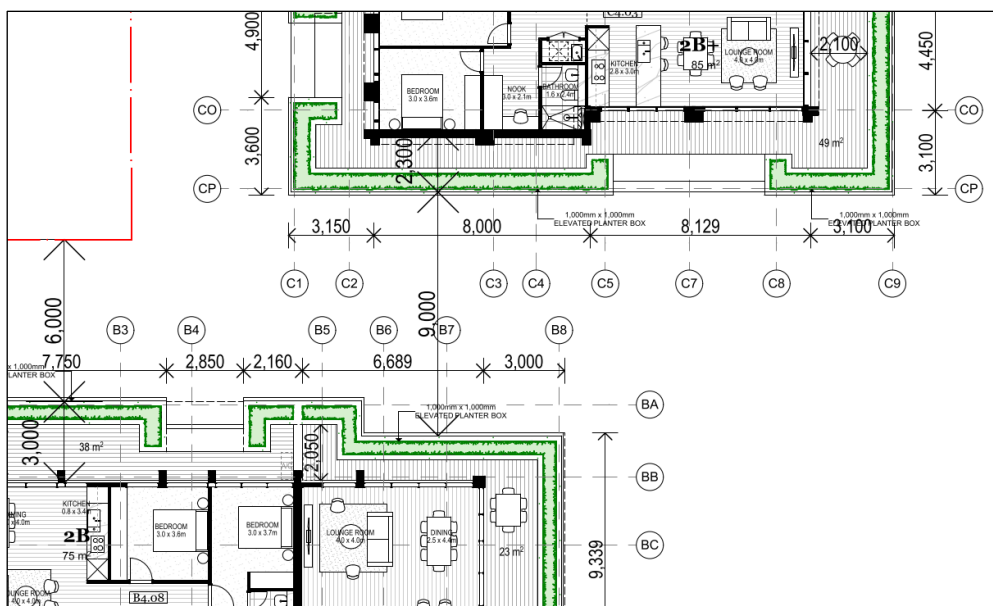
Building separation at level 4 (5th storey) – 18m required.
